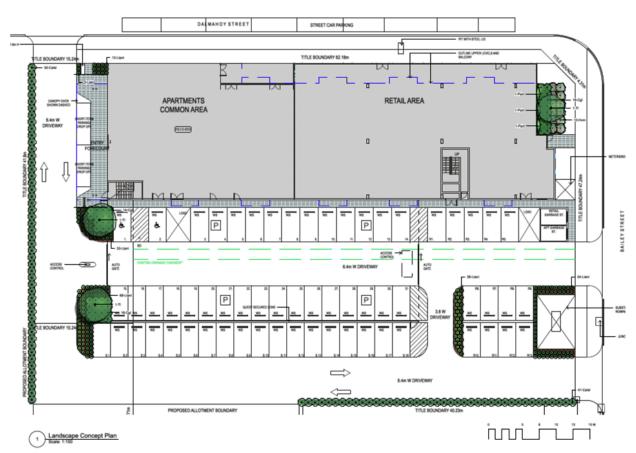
Extract of Landscape Concept Plan demonstrating proposed car parking.
